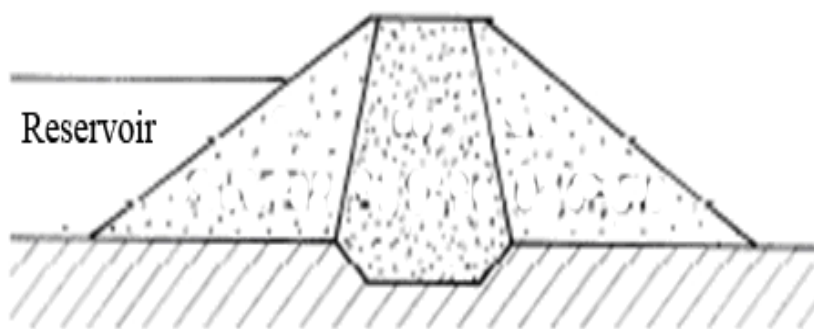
Sketch of an earth dam cross-sectional profile (Source: Danida, 2006)
